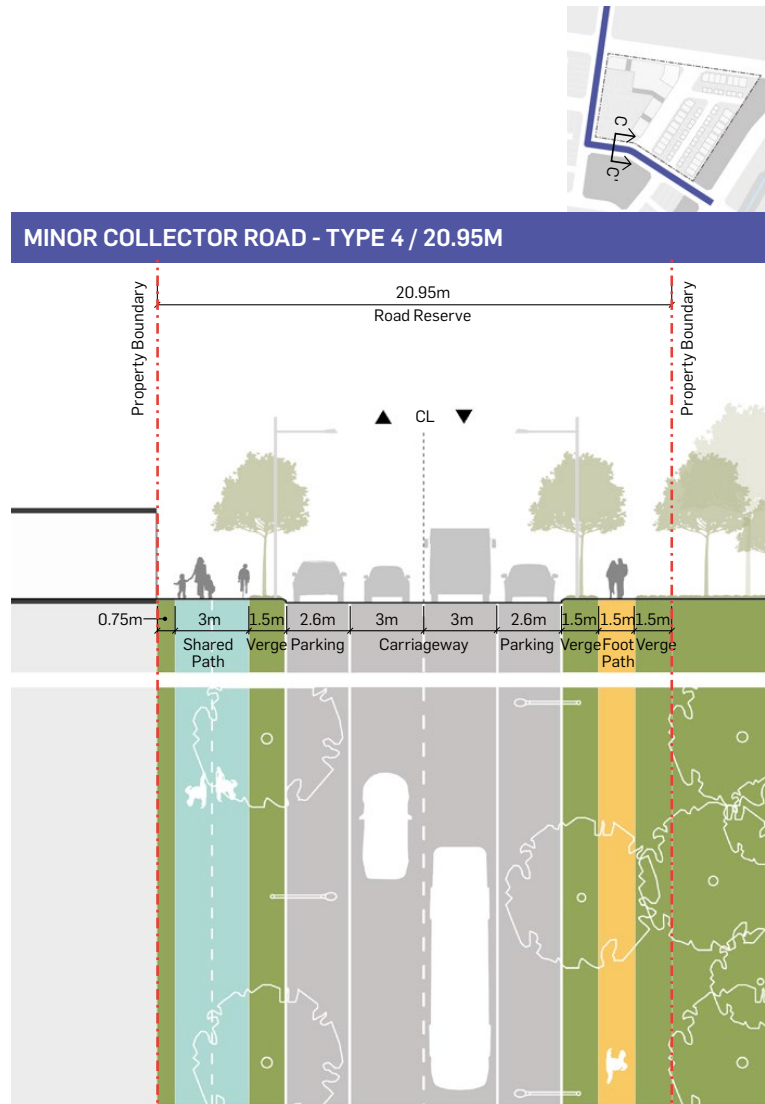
Indicative Street Section C-C' - Minor Collector Road - Type 4
